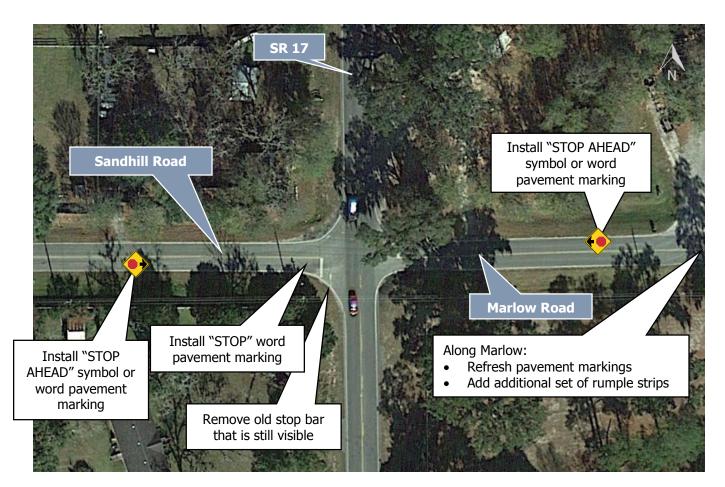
RECOMMENDED SHORT TERM PAVEMENT MARKING IMPROVEMENTS
